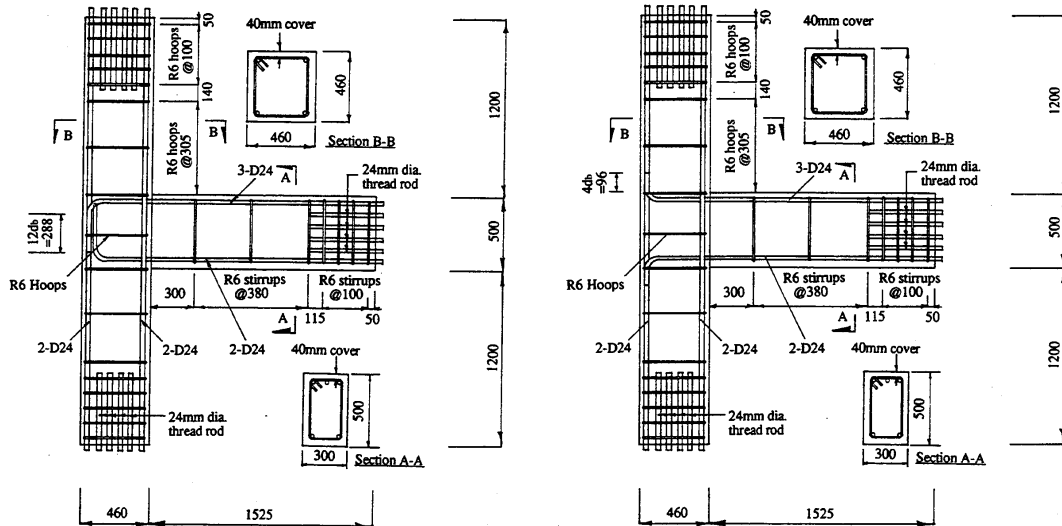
Typical pre-1970s reinforced concrete beam-column joint in New Zealand
